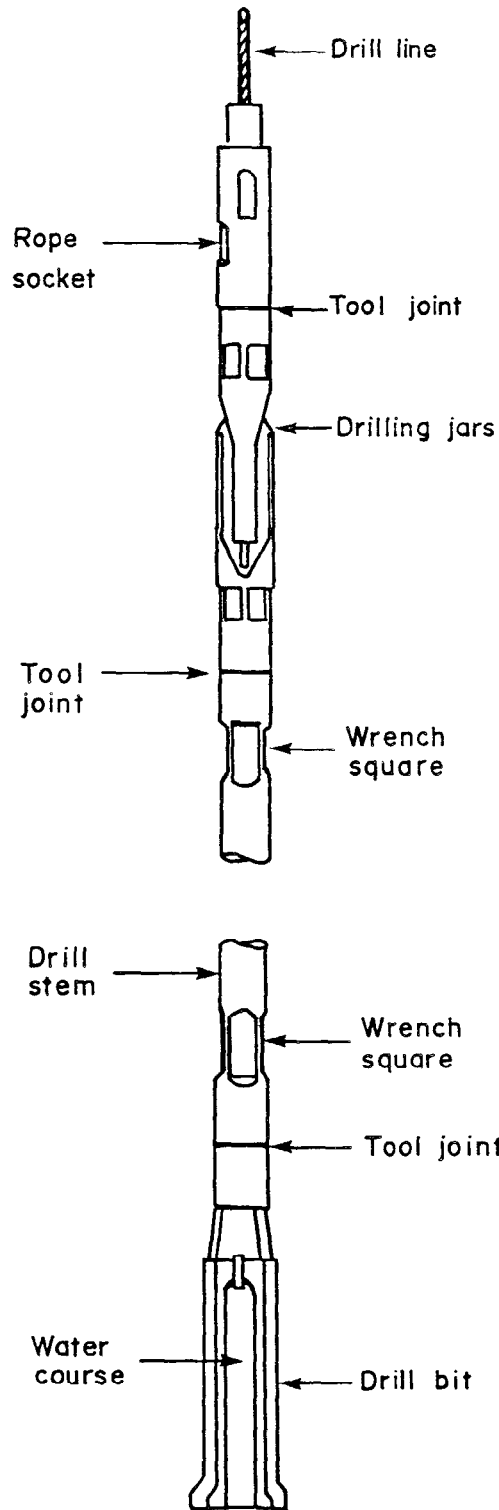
Components of the string of tools for cable-tool drilling (Johnson Division, UOP, Inc., 1975)
